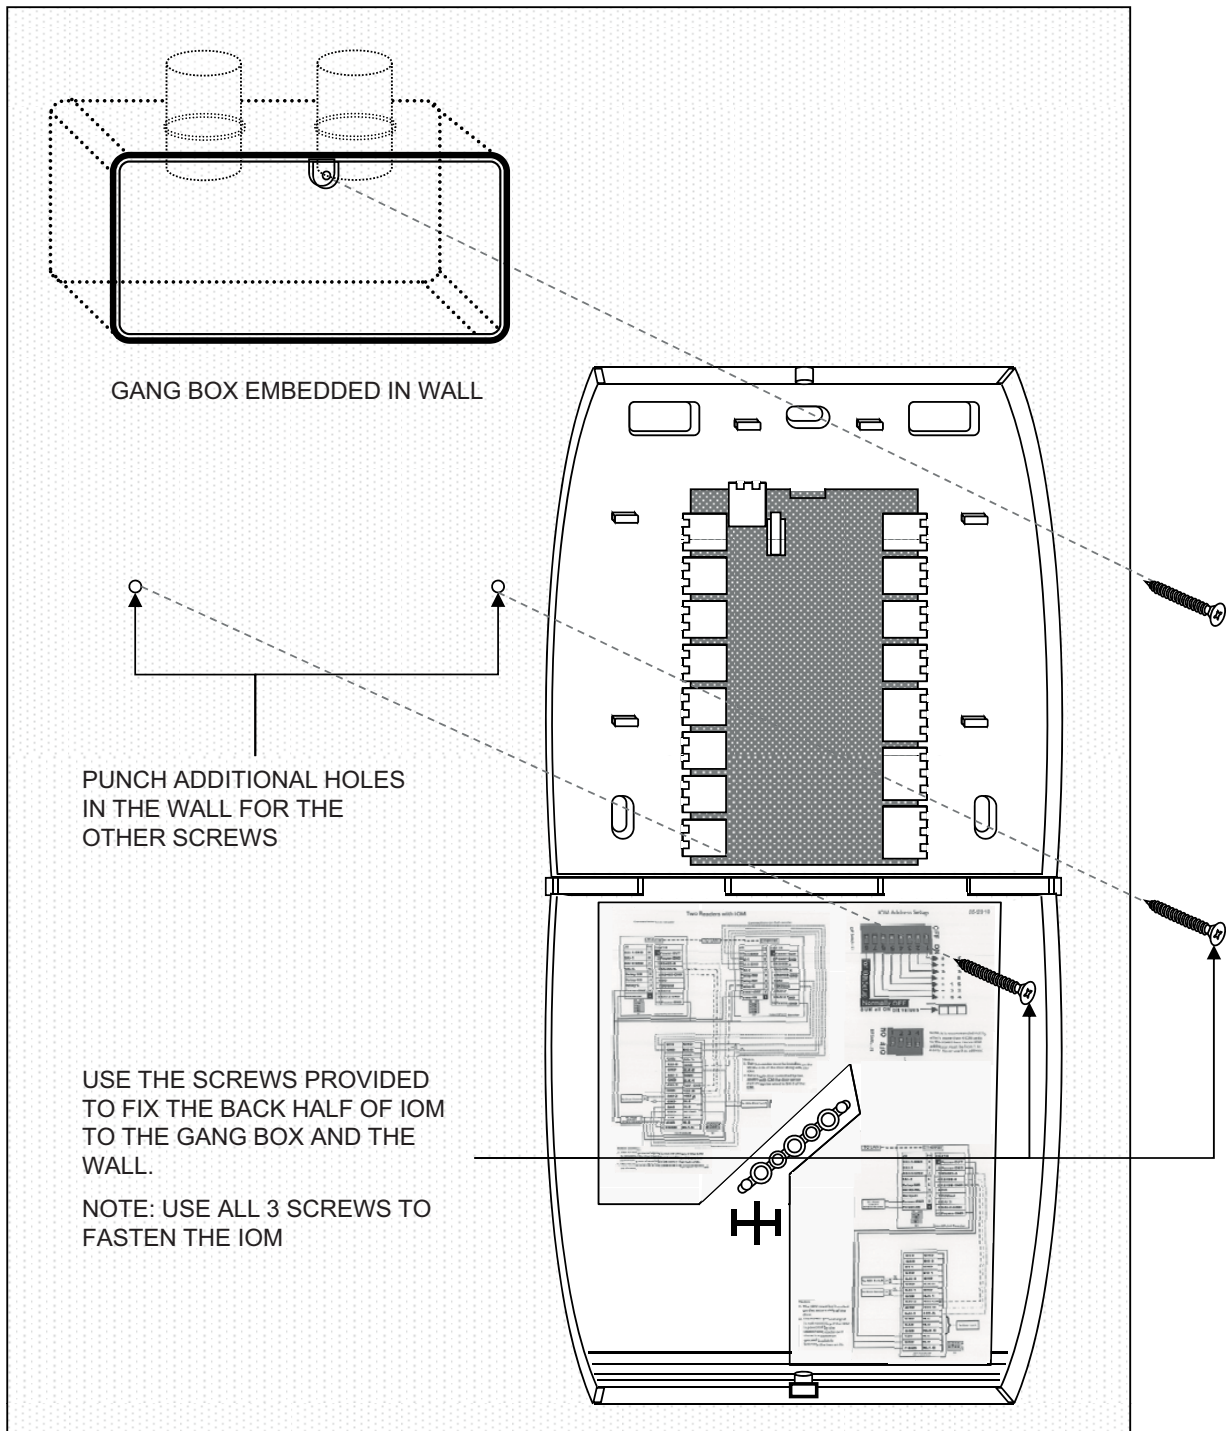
Mounting the IOM on a concrete wall using gang box and conduit
